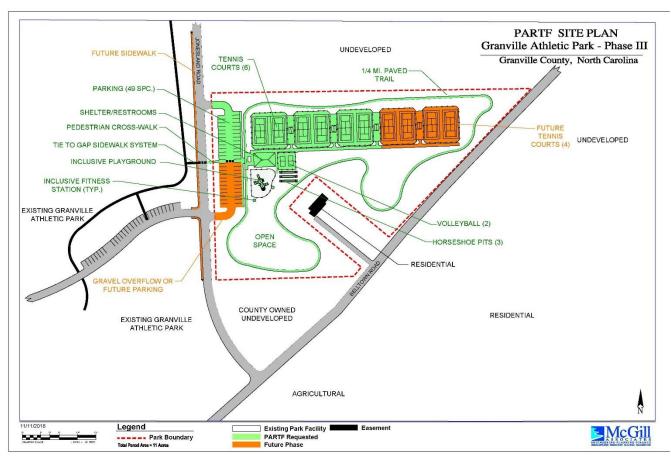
Phase III Site Plan as Submitted for PARTF funding
